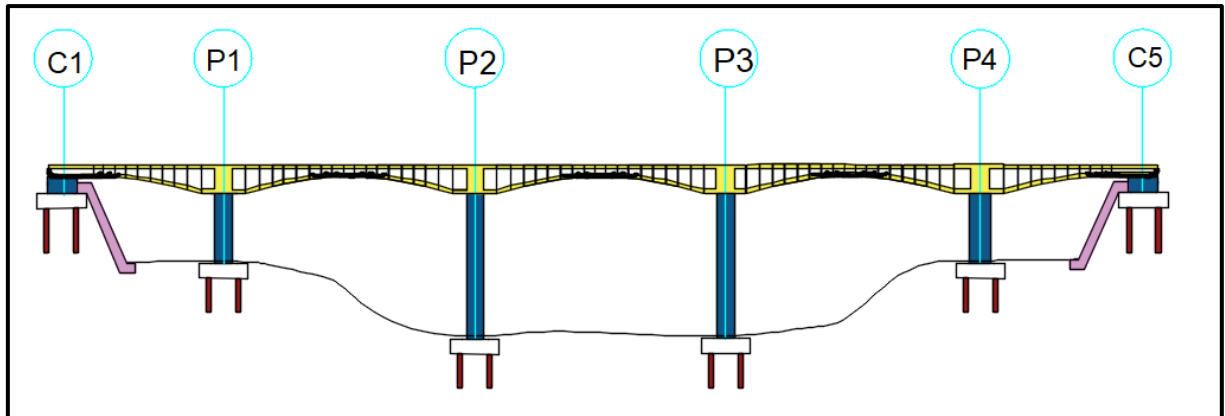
Completed Bridge-Final Structural Configuration (C1 to C5)
